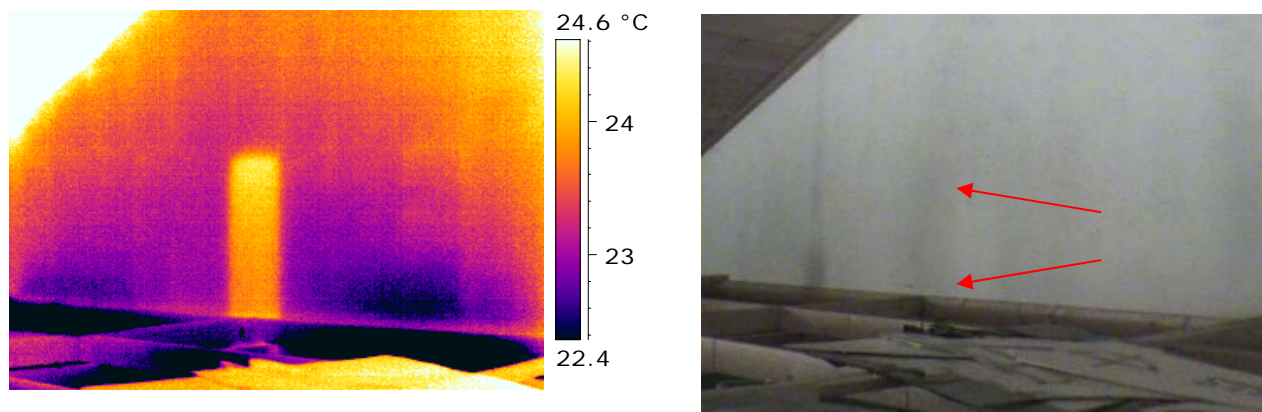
Thermogram/photo pair shows a warm rectangular region of missing or damaged insulation. The area is along the north wall towards the west edge of the wall.
